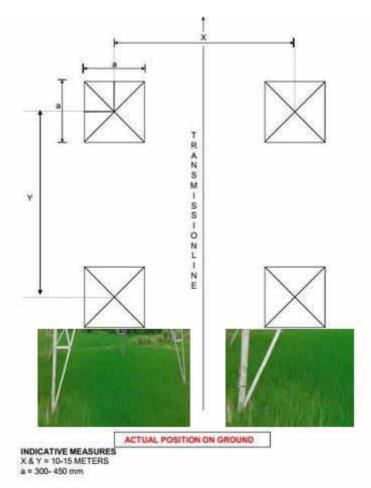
Typical Plan of Transmission Line Tower Footings Showing Actual Ground Position and Extent of Impact
